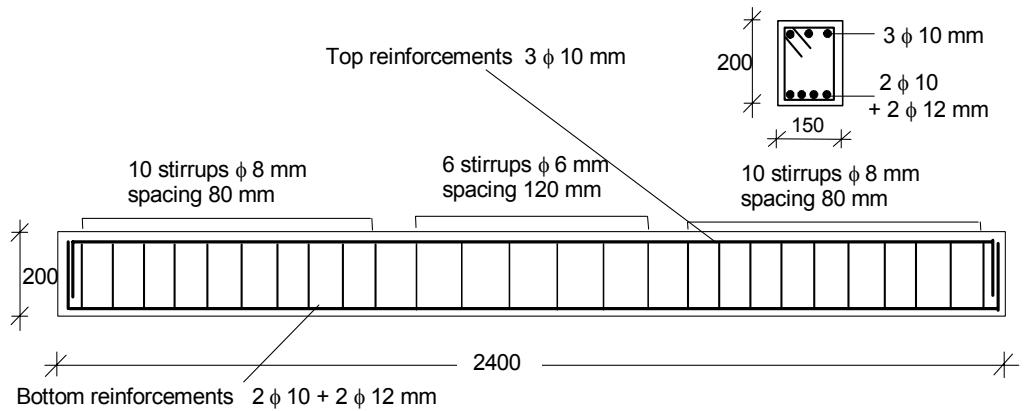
Geometry and reinforcement of the beams (dimensions in mm).
